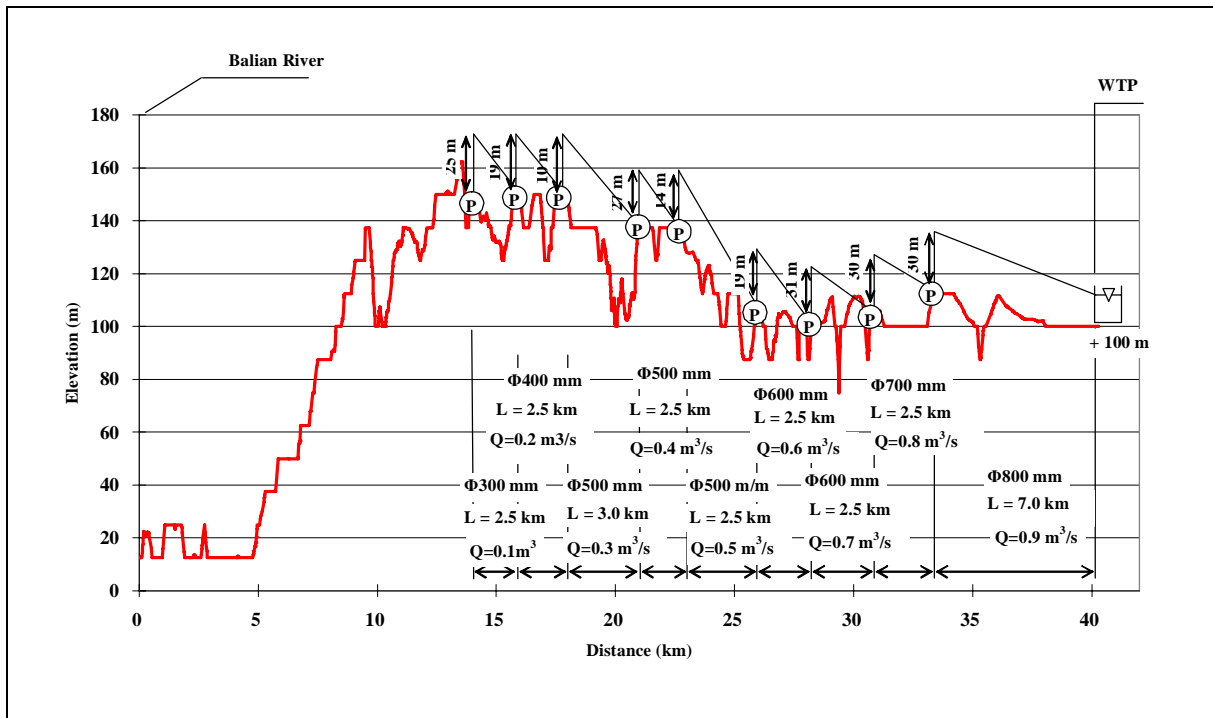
Longitudinal Section and hydraulic Gradient Line of Alternative C5
